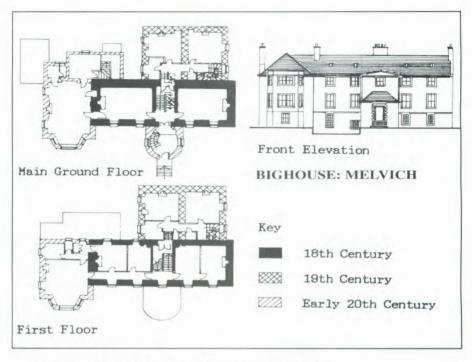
Plan and elevation, Bighouse Lodge. ca 1980.
